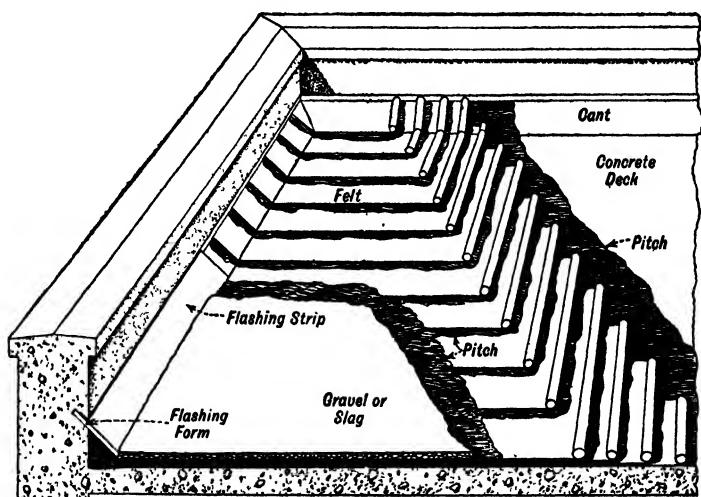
Method of Application of Tar and Gravel Roof. (See p. 655.)
